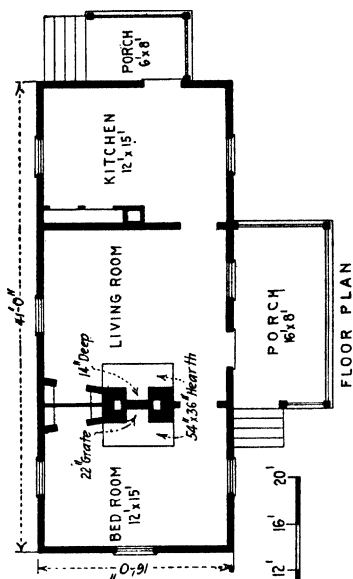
SINGLE THREE-ROOM HOUSE.
